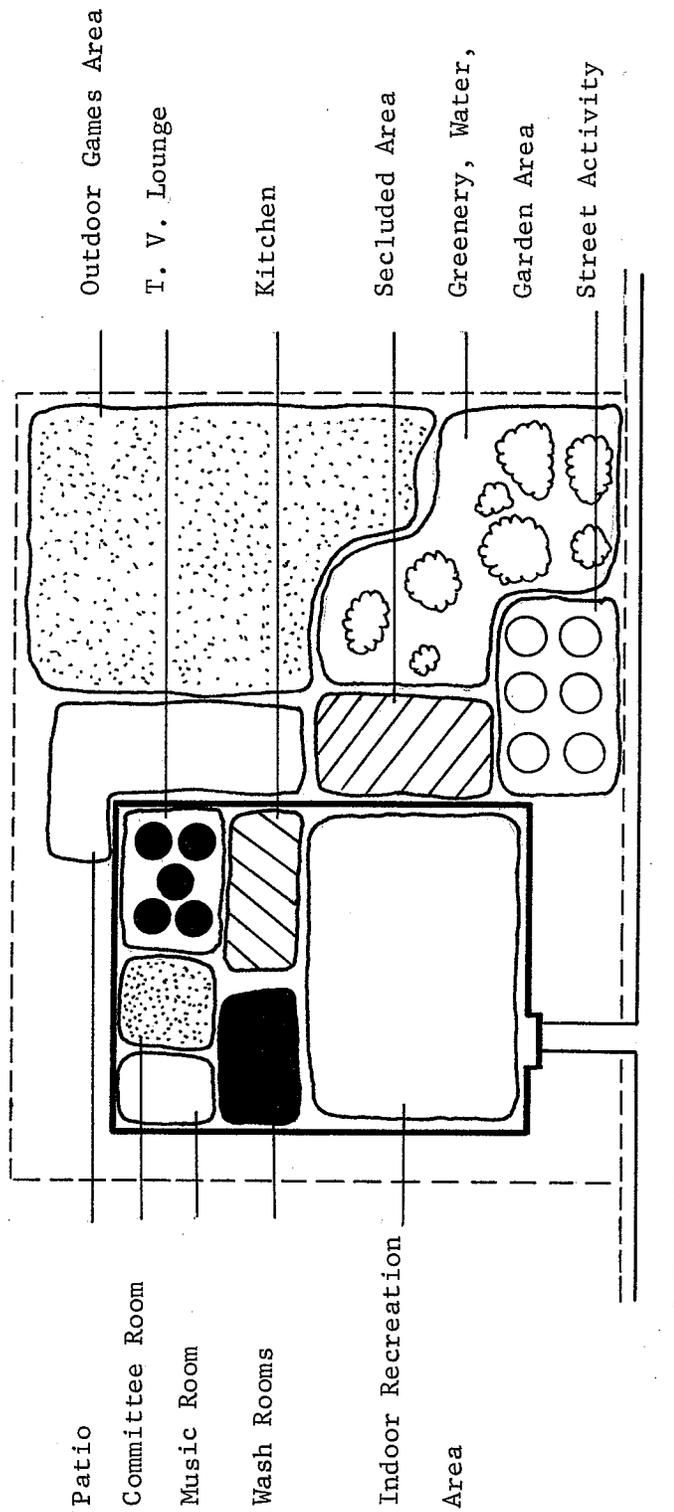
Site and Floor Plan of a Senior Citizens' Recreation Facility.
